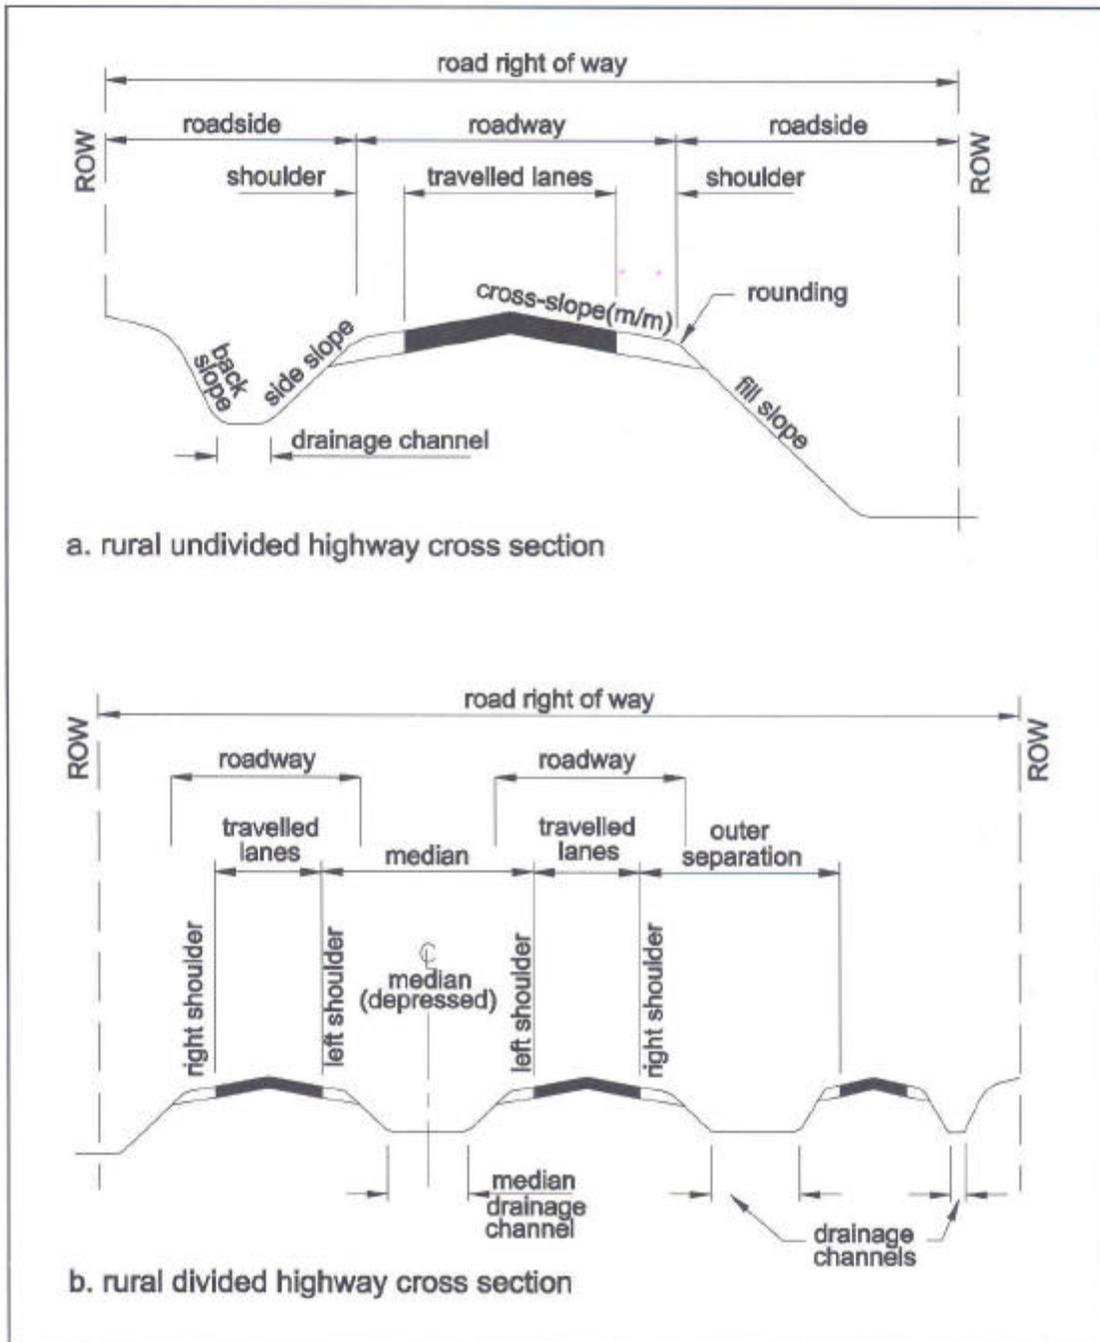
illustrates typical cross-sections for rural roads. In general, rural roads in Hamilton are constructed with gravel shoulders and ditches leading to natural drainage channels, as illustrated by the photos below.
